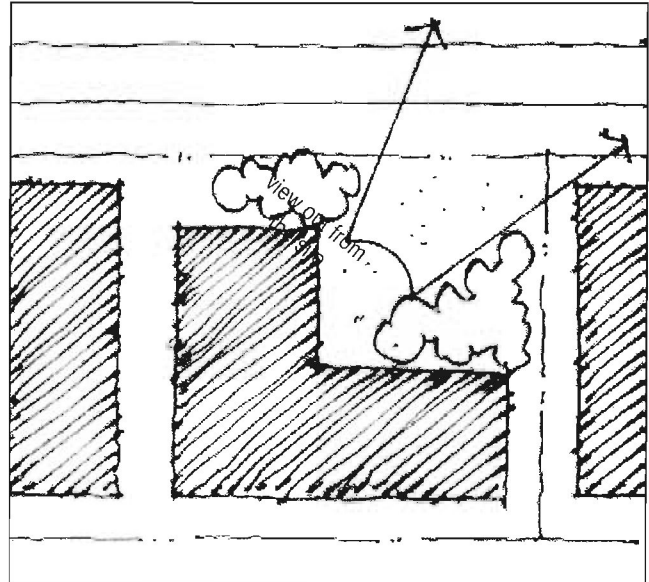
d.6.b. arrange buildings, landscaping and open space on the site to enhance views
